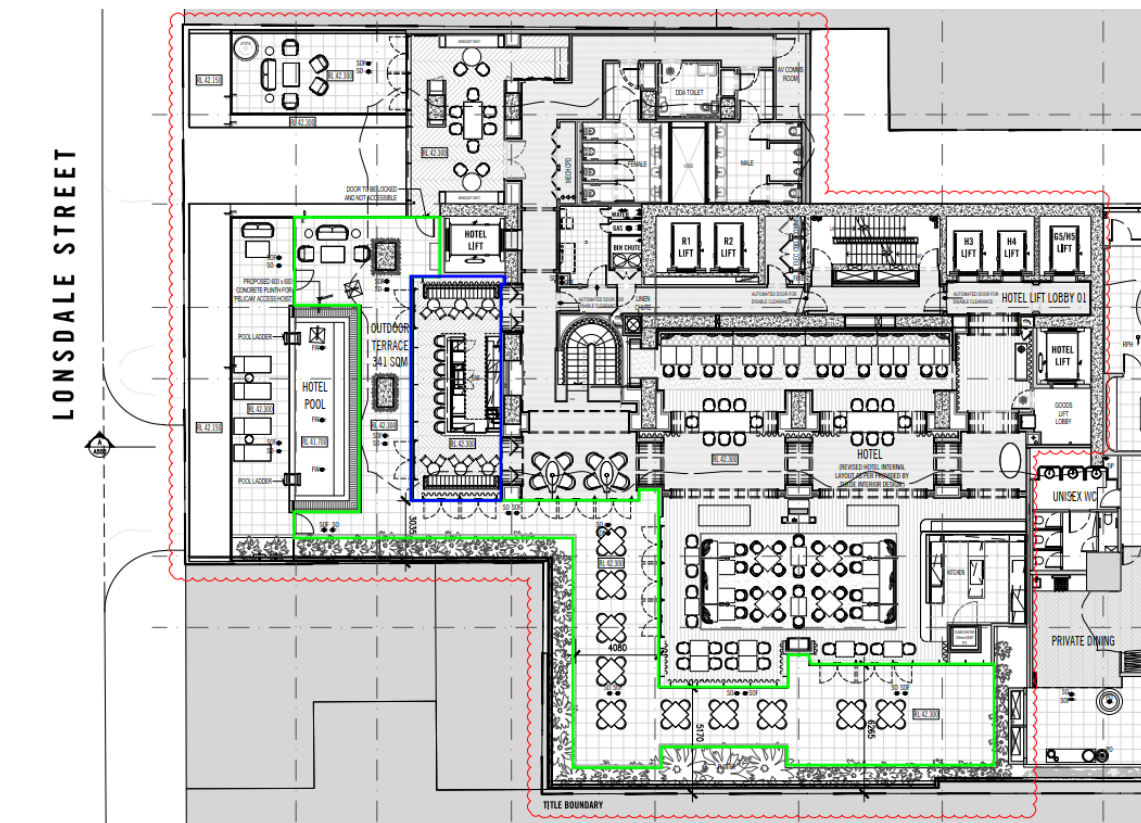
Extract of Proposed Level 7 Drawing (Source: Elenberg Fraser) (Proposed Bar Area Outlined in Blue and Outdoor Area Outlined in Green)
